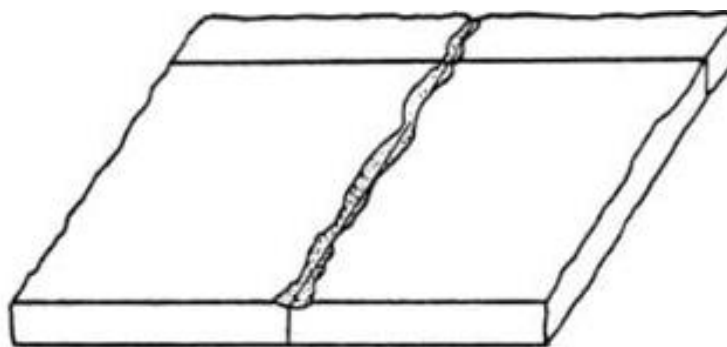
Joint spalling in rigid pavement slabs [60].
